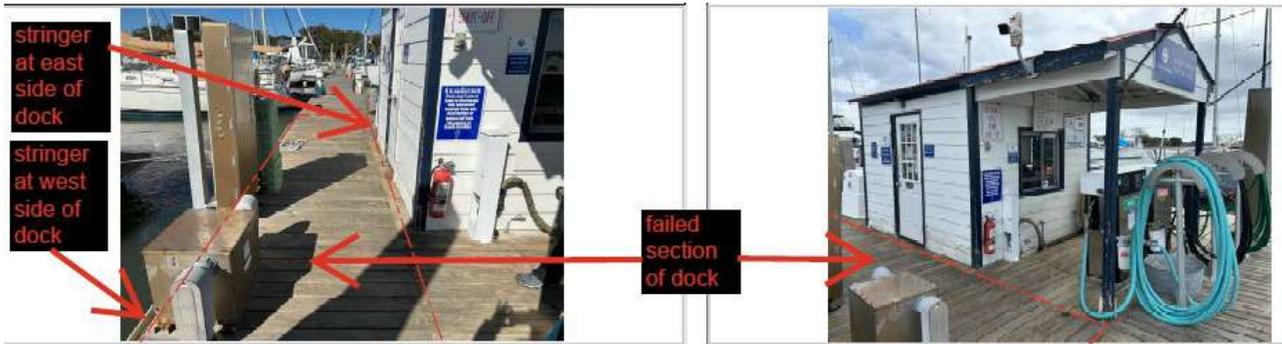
Site 5: A dock at A-G dock - area of failed dock section looking north, and adjacent pump station
